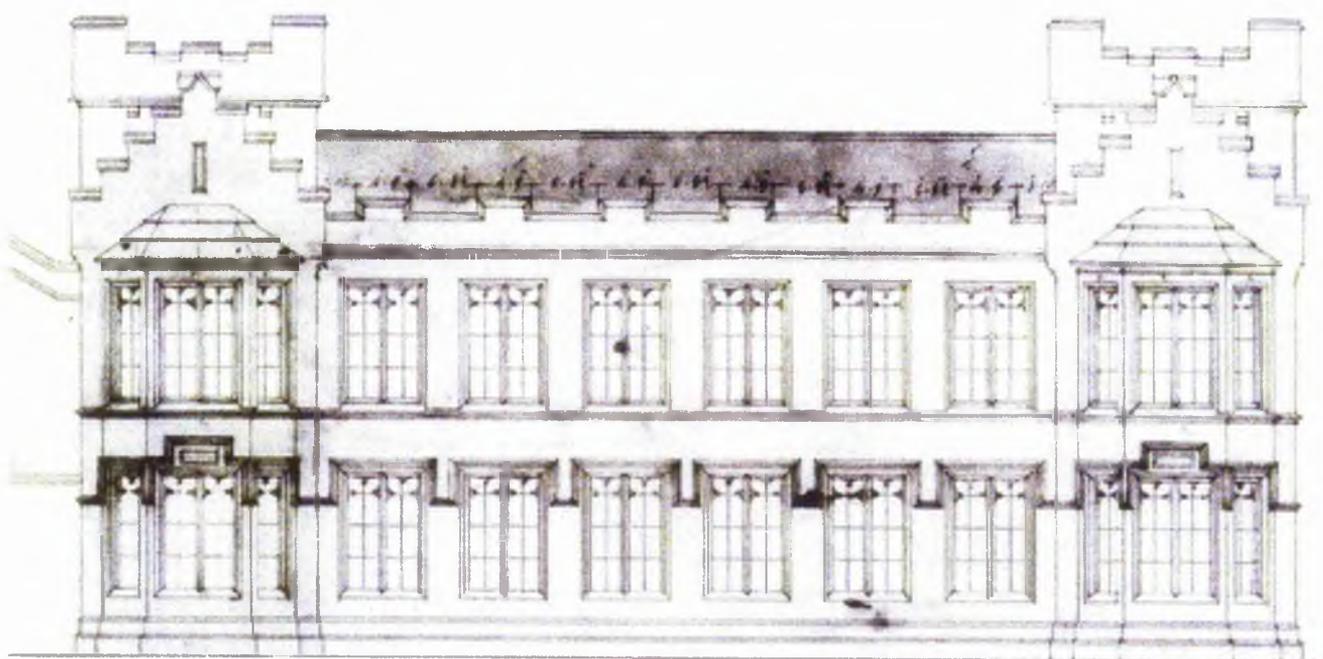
King'sCollege. East elevation of quadrangle wing as built. R.Matheson, 1859.
